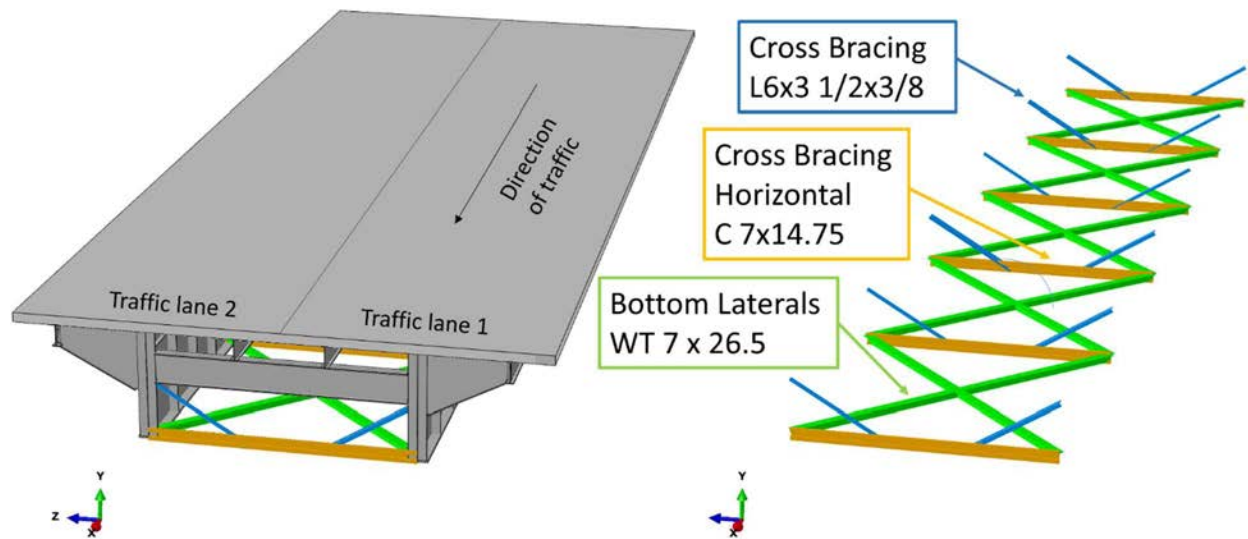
Bridge structure with bracing system (left) and isolated bracing system and beam profiles (right)
